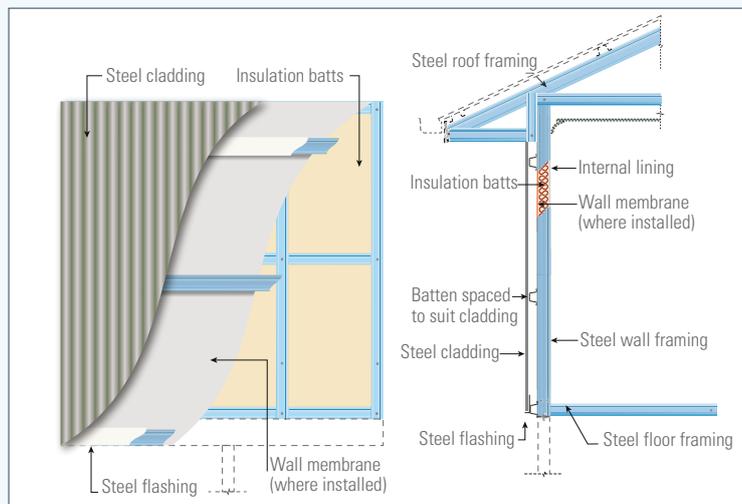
(a): Wall system with eave, BAL-12.5 to BAL-40
